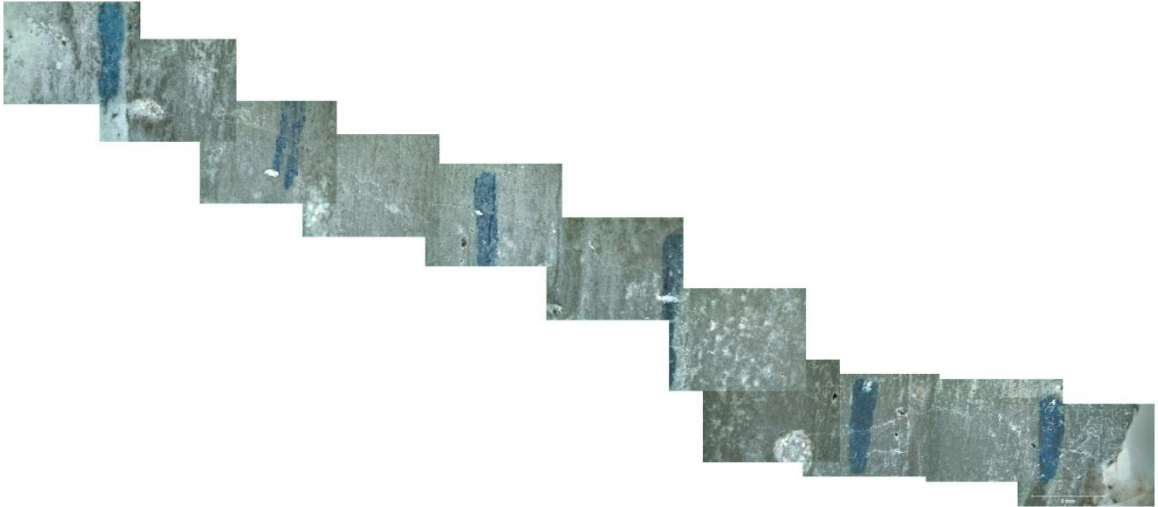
Microscopy image (6.3x zoom) of F25 flexure crack
